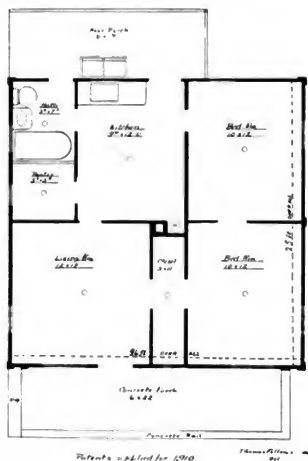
FLOOR PLAN, MODEL CONCRETE HOUSE.
